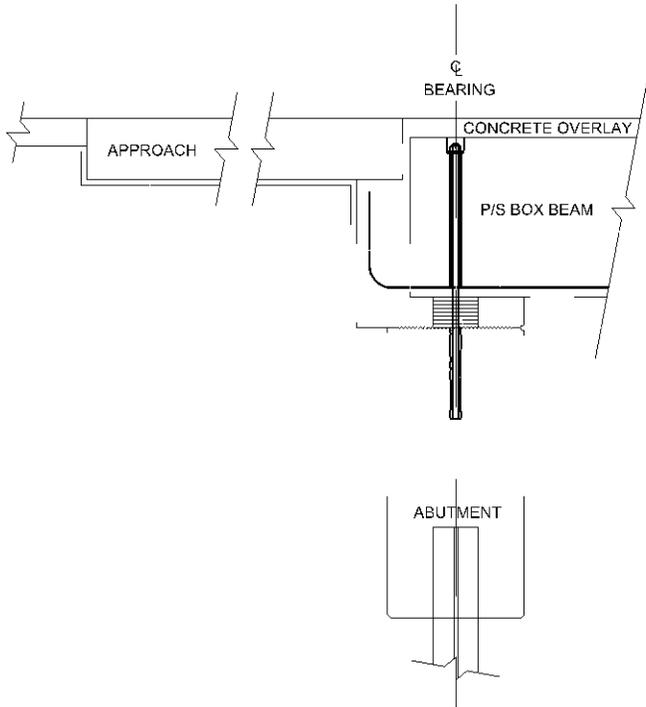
1 Box Beam Type A Bridge End Detail
